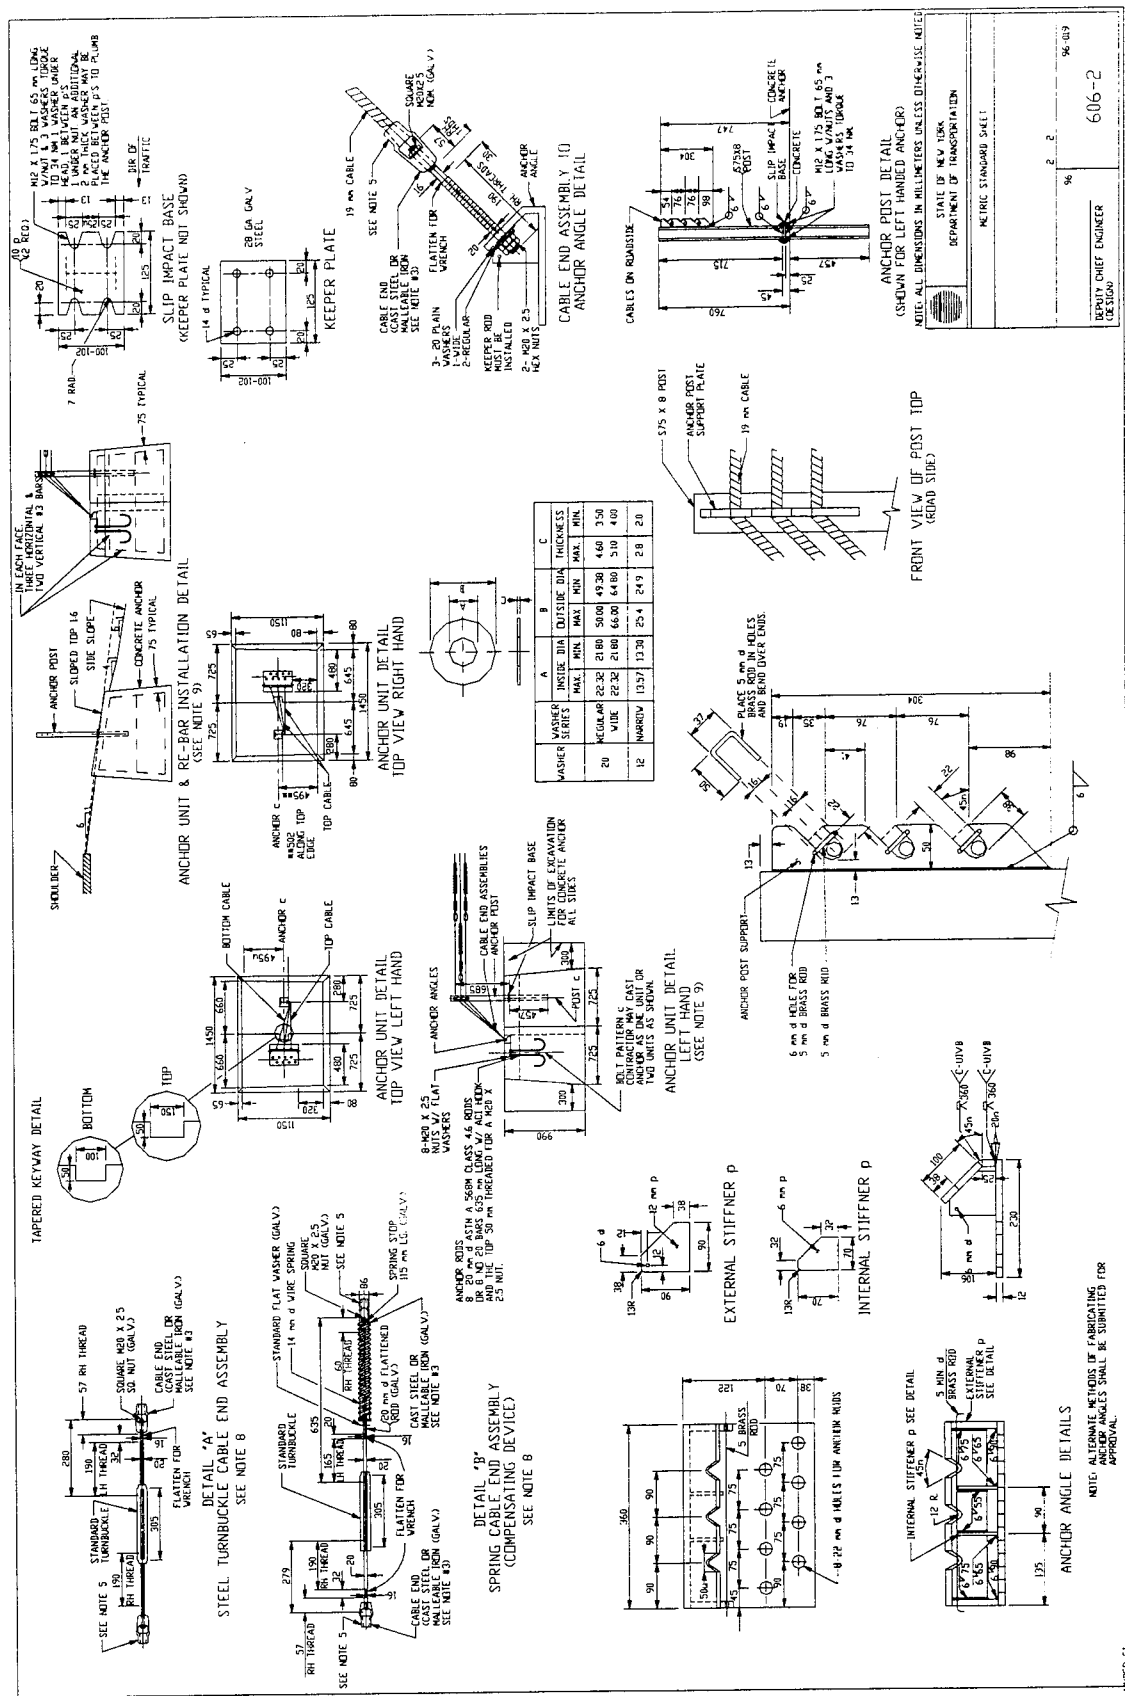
Details of the New York cable terminal used for test 404211-8 (continued).
